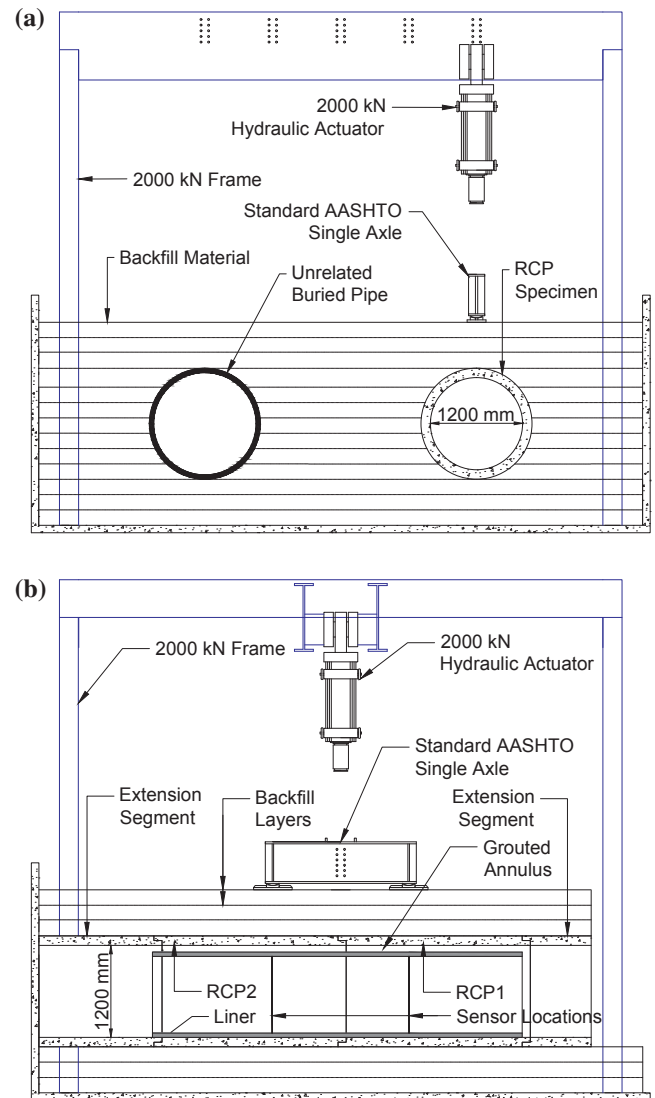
Front (a) and Side (b) views of the test layout for tests T1, T2 and T3.
